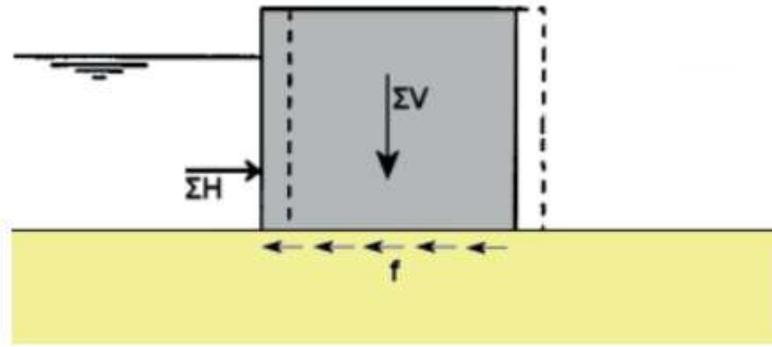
Principle of horizontal stability (Manual Hydraulic Structures, 2019)
